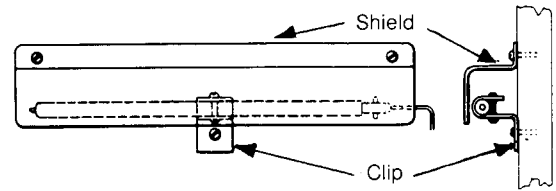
Installation of TK-6X24 Using AT-211 Outside Bulb Shield.
